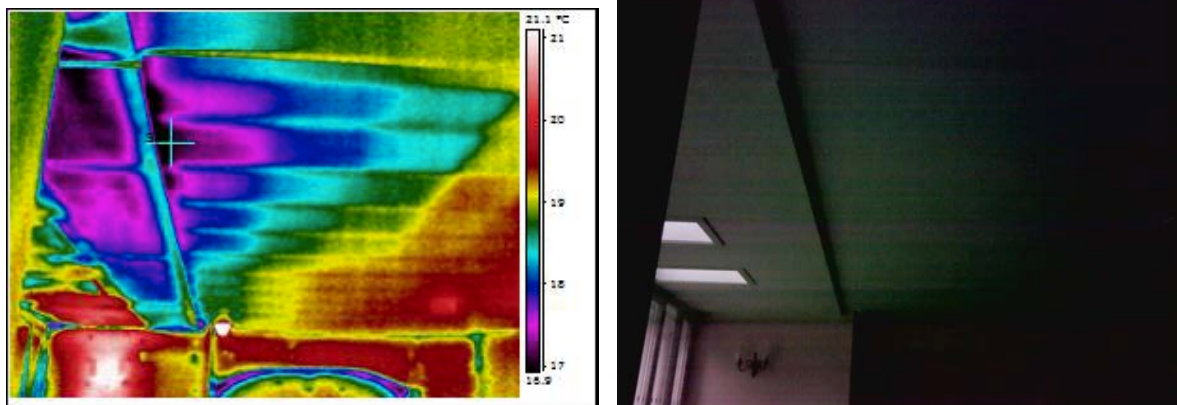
Room G25. Ground floor Council Chamber. The image shows thermal anomalies on the ceiling of the Council Chamber. It is likely to be due to poor insulation of pitched roof above windows.
